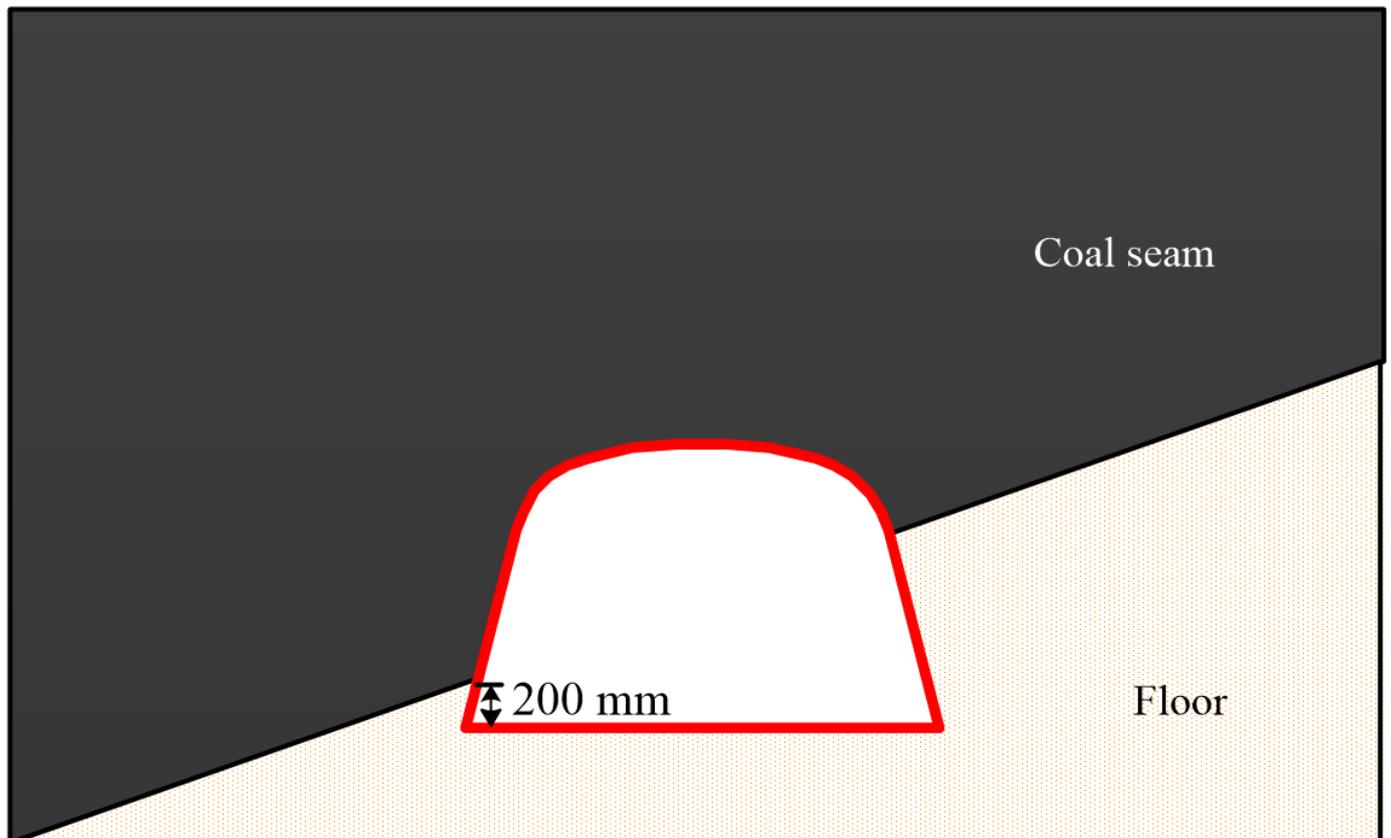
Schematic diagram of floor breaking and side lowering of the roadway.
